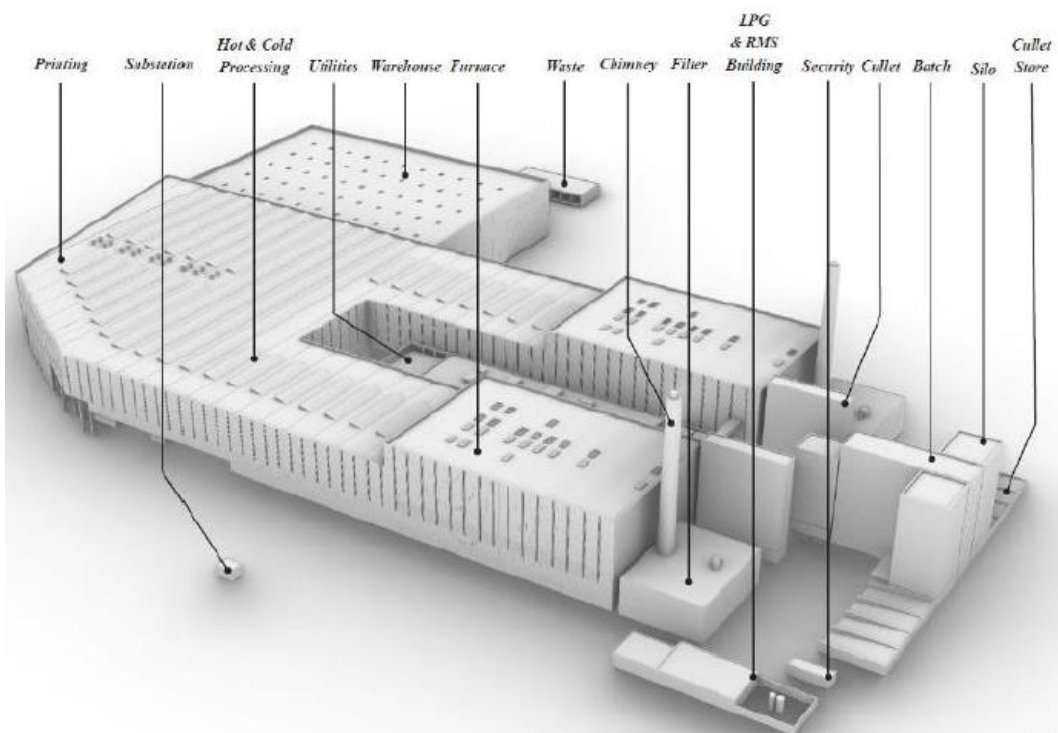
Proposed built form of the Dragon Glass Manufacturing Facility.
